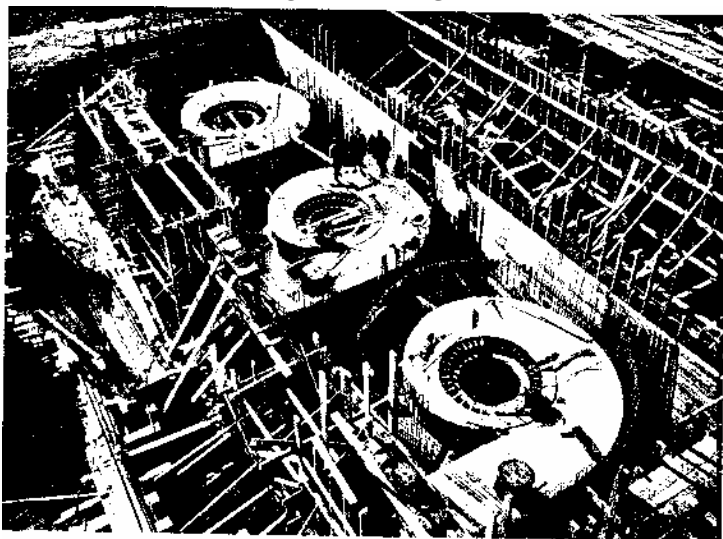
View of the Lely plant in process of construction, showing great concrete casings for pump runners. (Courtesy Werkspoor.)
